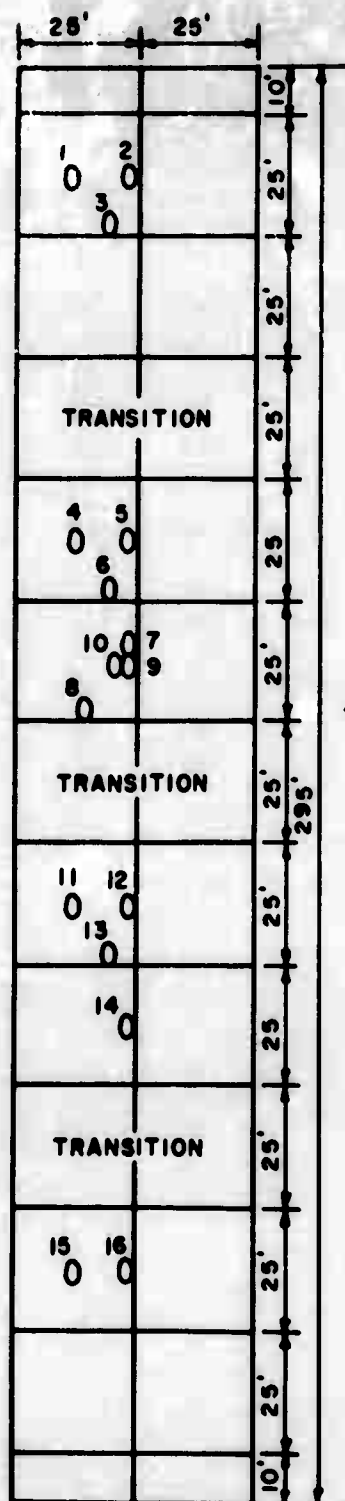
Wheel Positions for Single-Wheel Static Load Tests, Rigid Pavement Test Section
